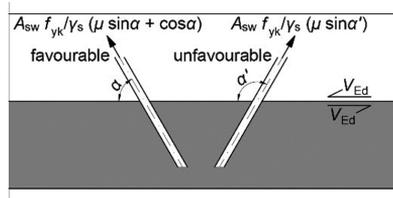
Principles of determining load capacity of connective reinforcement acc. to [12]
